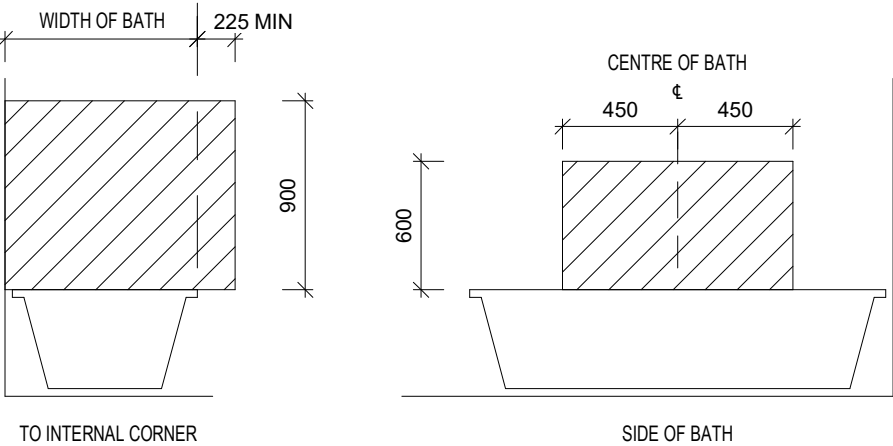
B - LOCATION OF SHEETING FOR WALLS SURROUNDING A BATH
